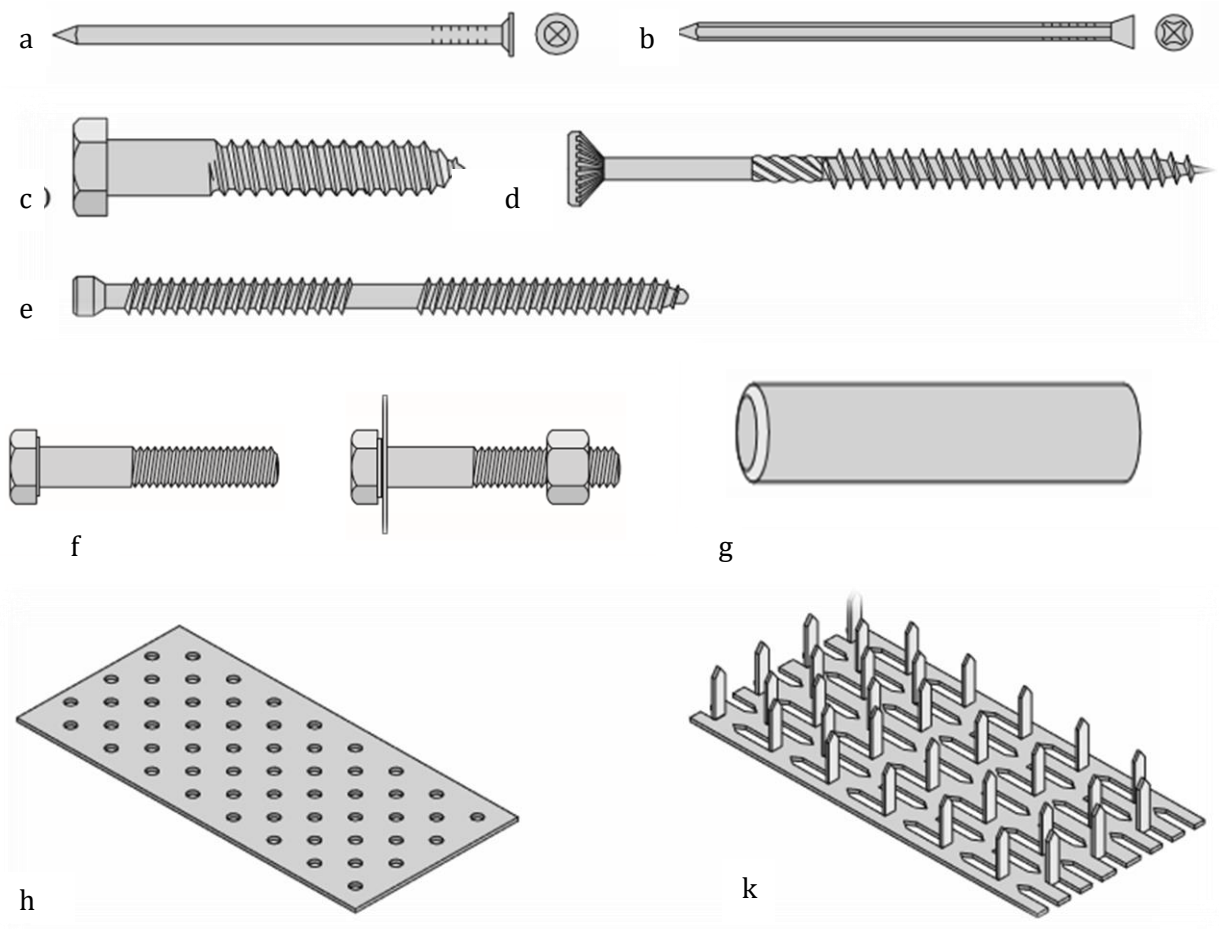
Dowelled joints: a) Round, smooth nail, b) grooved, smooth nail c) hexagon head wood screw requires pre-drilling and is however often replaced by for instance d) wood screw with countersunk head on e) double threaded wood screw f) Bolt, often to be completed with washer and nut g) dowel h) nail k) punched metal plate fastener.[4]
